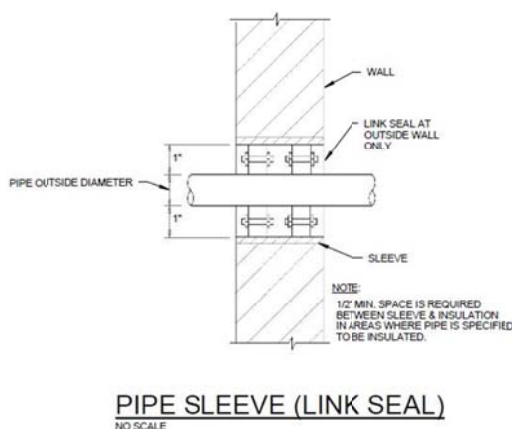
Hydronic pipe sleeve detail, where pipe goes through a wall
